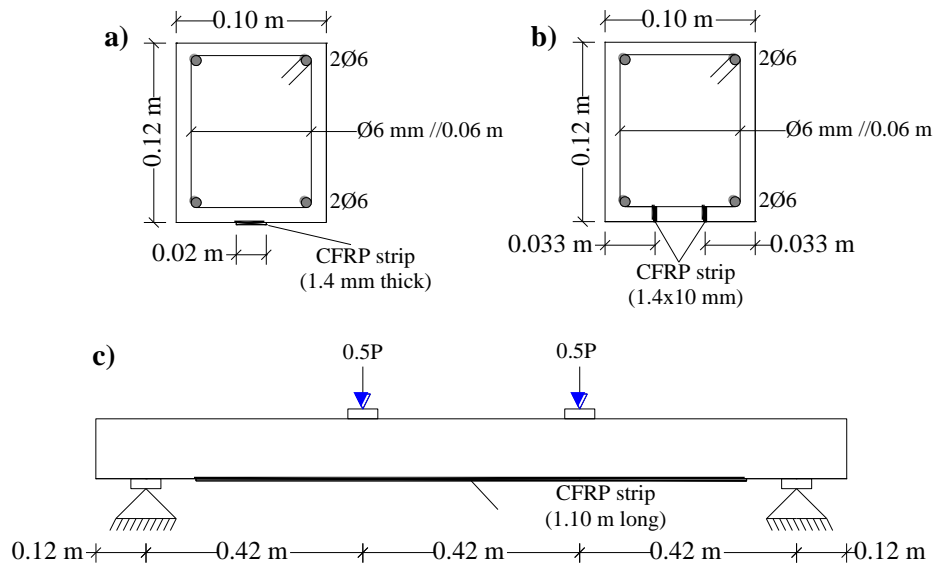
a) EBR-CFRP strengthened RC beams' cross section; b) NSM-CFRP strengthened RC beams' cross section; c) geometry of the beams (longitudinal) and load positions.
